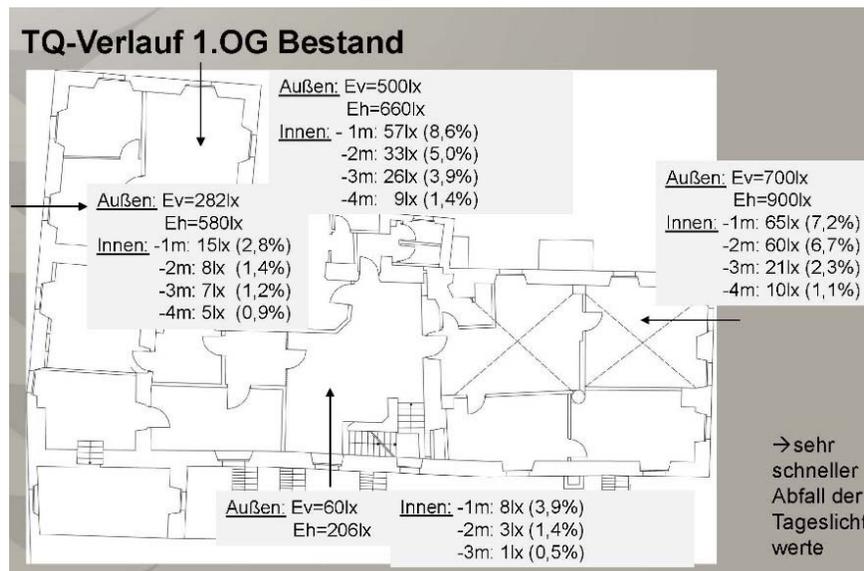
Gradual reduction of the daylight coefficient in north, east, south and west oriented room on the first floor of the building
